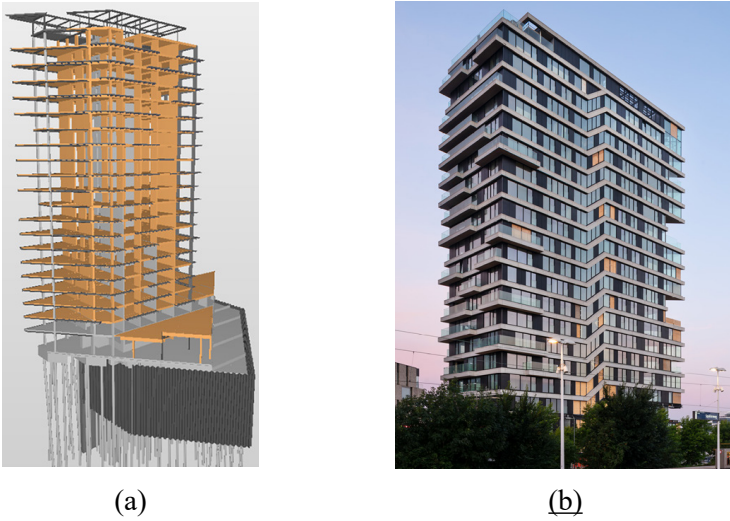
(a) Load-bearing system (Verhaegh et al., 2020), (b) façade perspective of the building (Ilgin, 2023)
